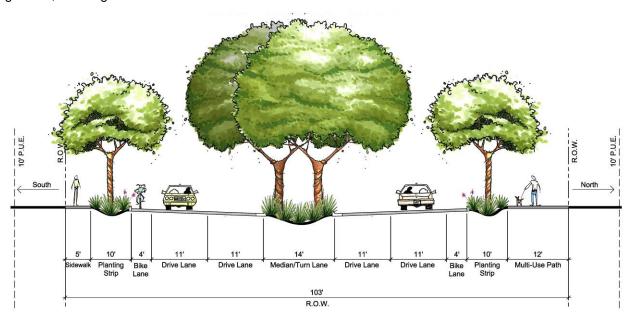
'A' Street - Daniels Street - Section
